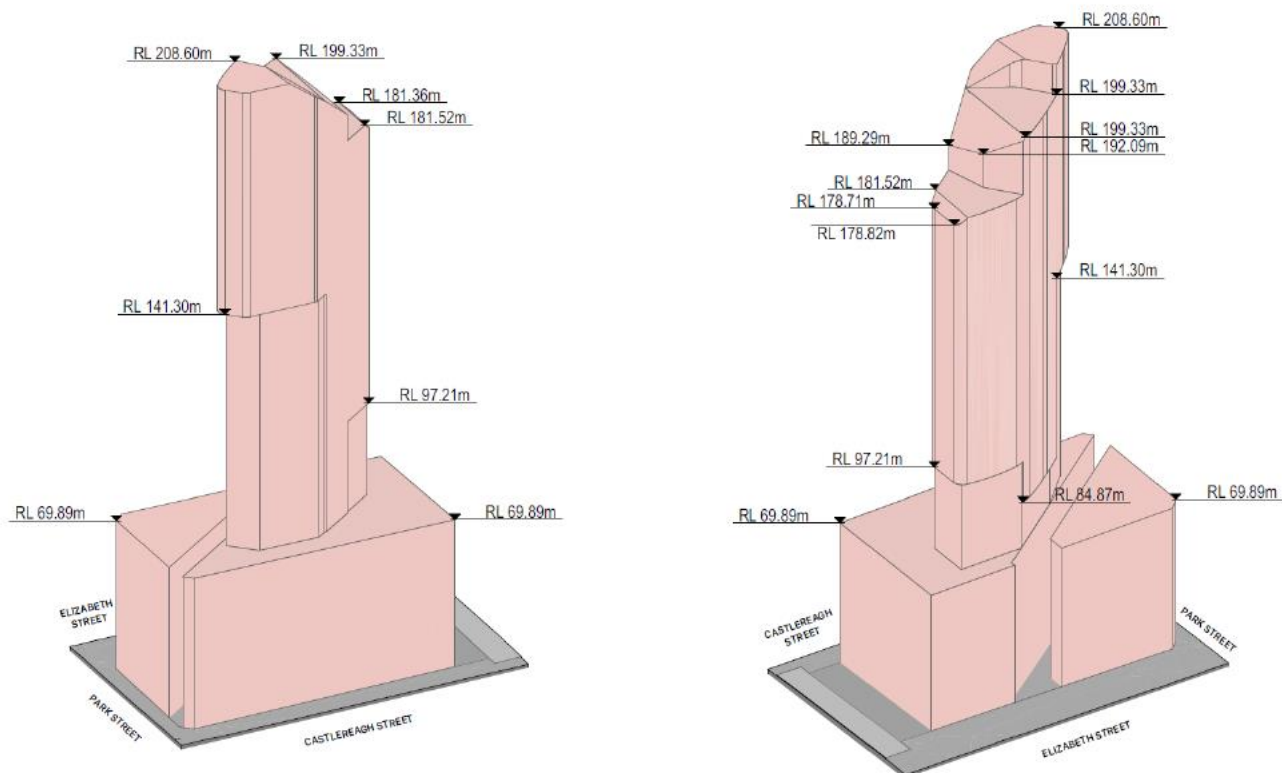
| Axonometric diagrams of the Concept Modification SSD – Castlereagh Street (left) and Elizabeth Street (right) elevations (Source: Ethos Urban EIS: Modified Building Envelope Drawings)
